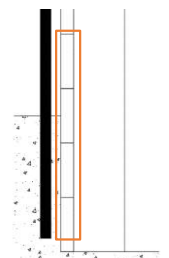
the boards stacked on top of each other to make a formwork wall that will encase
